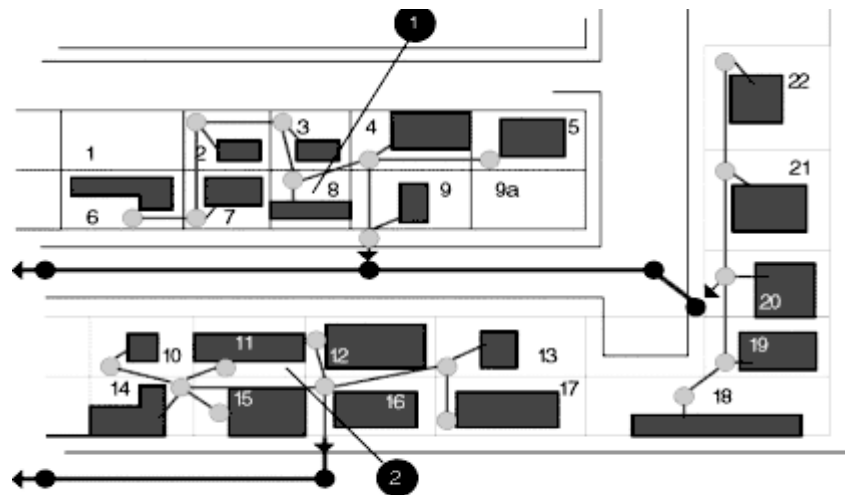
Pipe Layouts for Condominium Sewerage (UNEP)
